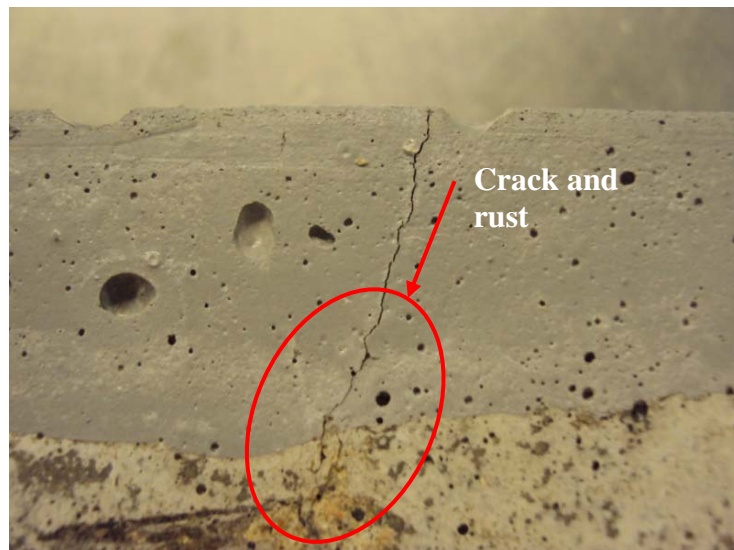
Rust and Crack in Corrosion Specimen (SP3-CI-9)
